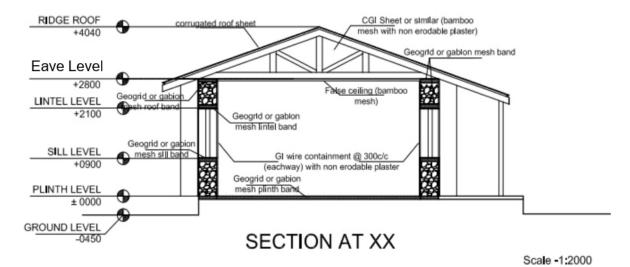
Type Design 2 (SM_Gabion): Semi-dressed stone masonry in mud mortar with GI gabion band and containment mesh on wall surfaces.
